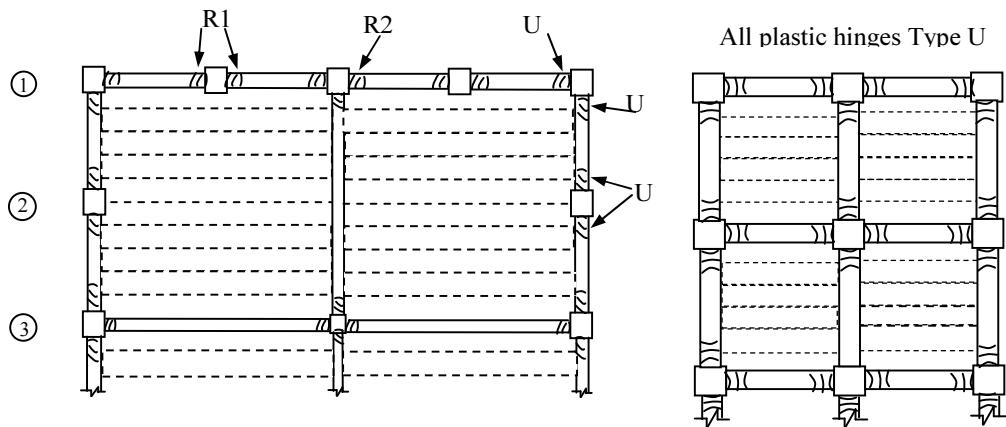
shows part of a floor plan where potential plastic hinge locations are labelled as U, R1 and R2. The label indicates the extent that the floor restrains elongation in the plastic hinge. In type U plastic hinges little restraint to elongation is provided (unrestrained) by the floor slab. In type R1 (restrained) the prestressed units provide significant restraint to elongation, while type R2 is intermediate between type U and R1.
